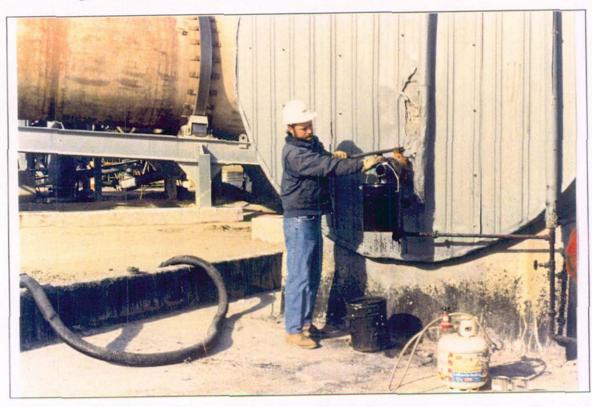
Collecting Bulk Liquid Asphalt Cement from the Plant
